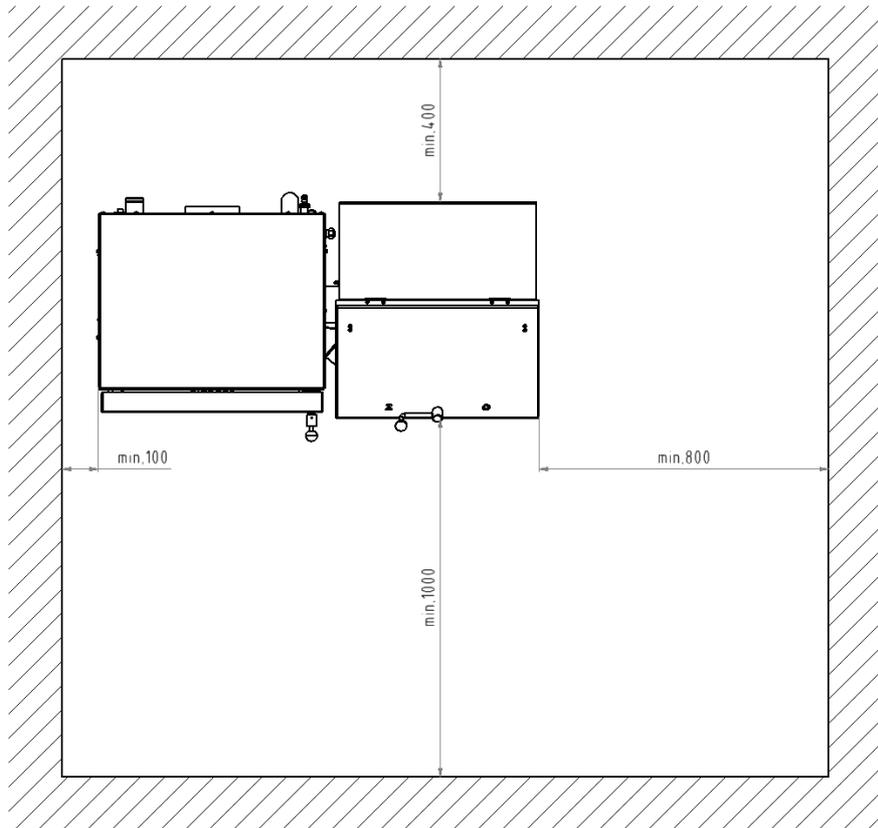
VIADRUS EKORET boiler positioning in the boiler room
